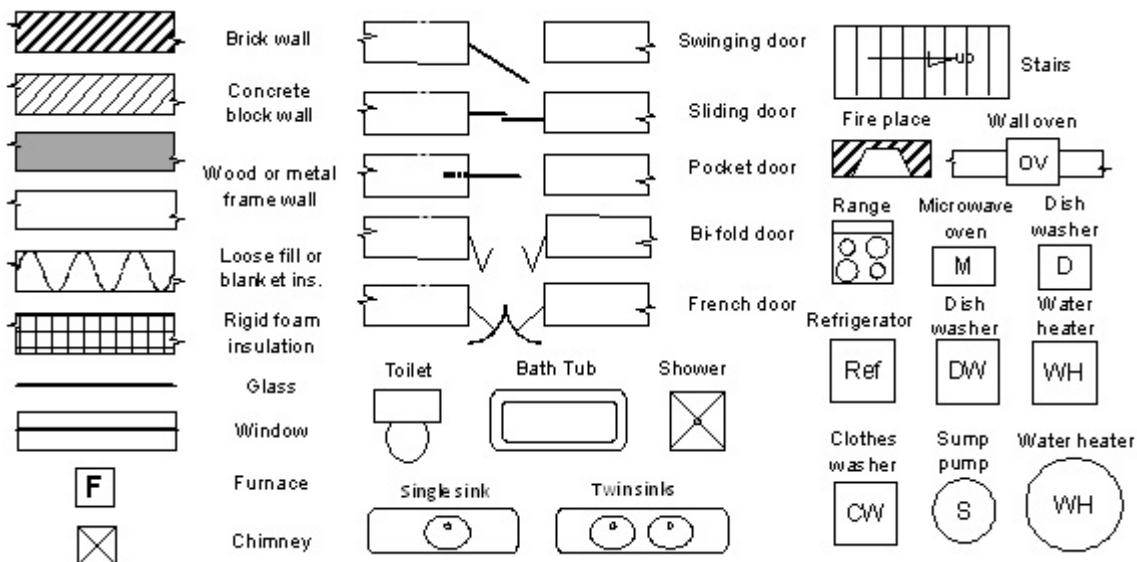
Typical plan symbols to indicate the type of construction and some of the appliances and fixtures to be installed.
